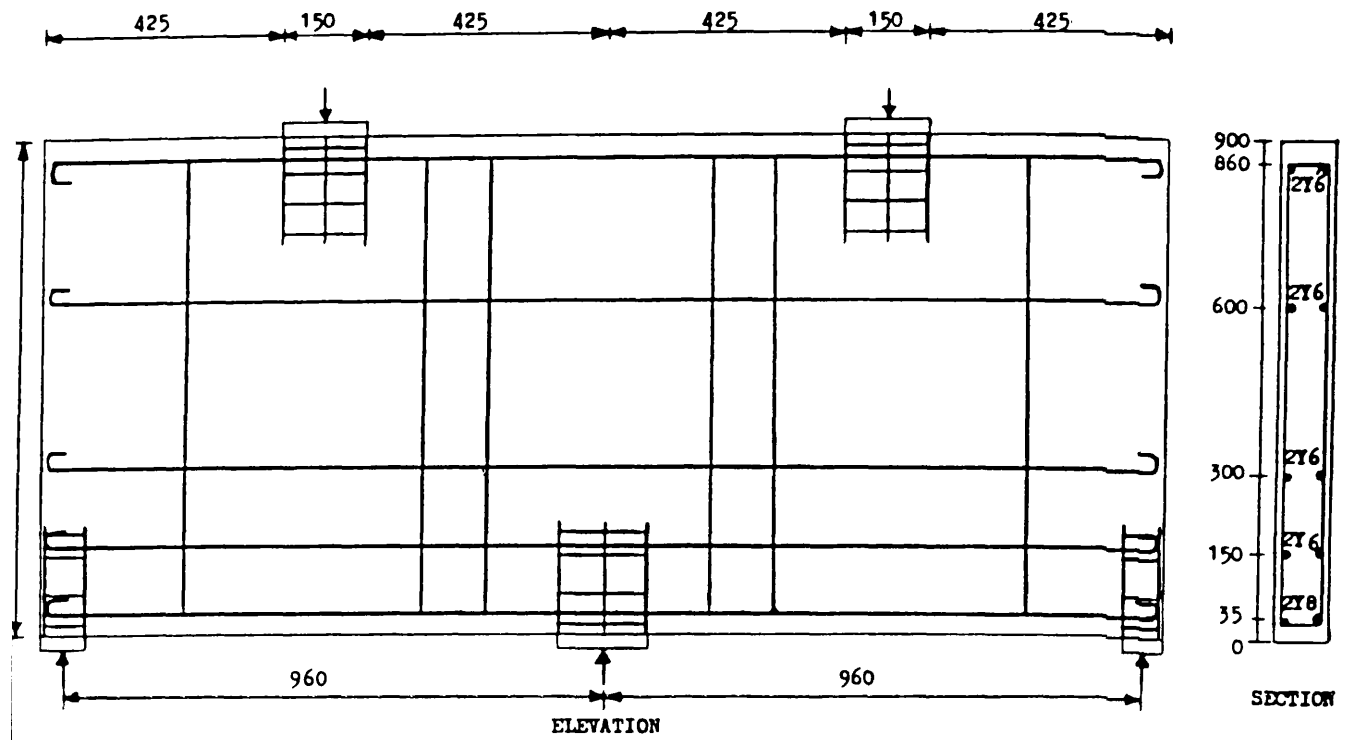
Dimensions and reinforcing details of girder TRGRAS1
